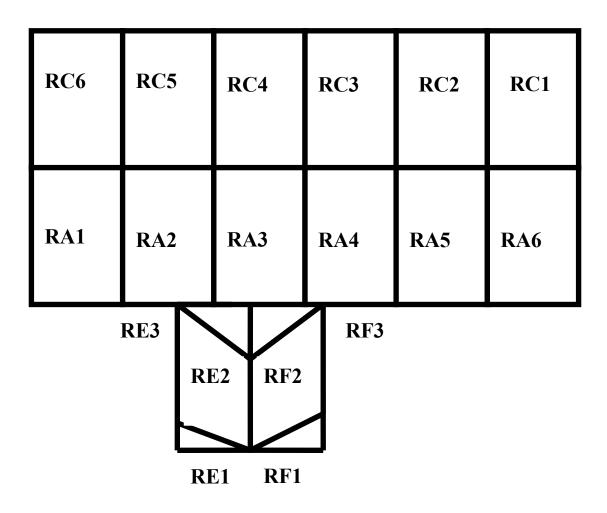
Sedro-Woolley SIP Home: Roof Panel Plan
